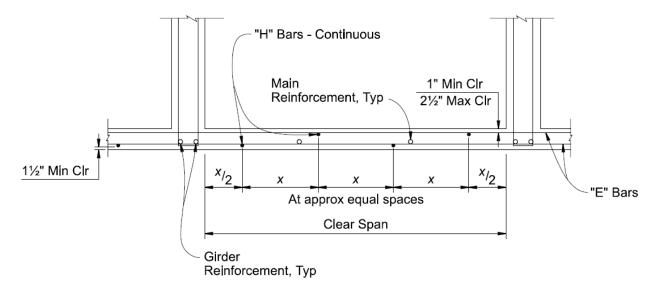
Concrete Box Girder Soffit Details
